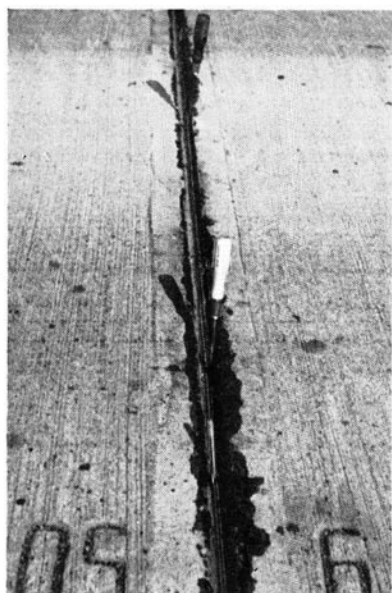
J-4 EXPANSION JOINT AT STA. 9 + 50 WITH ASPHALT
